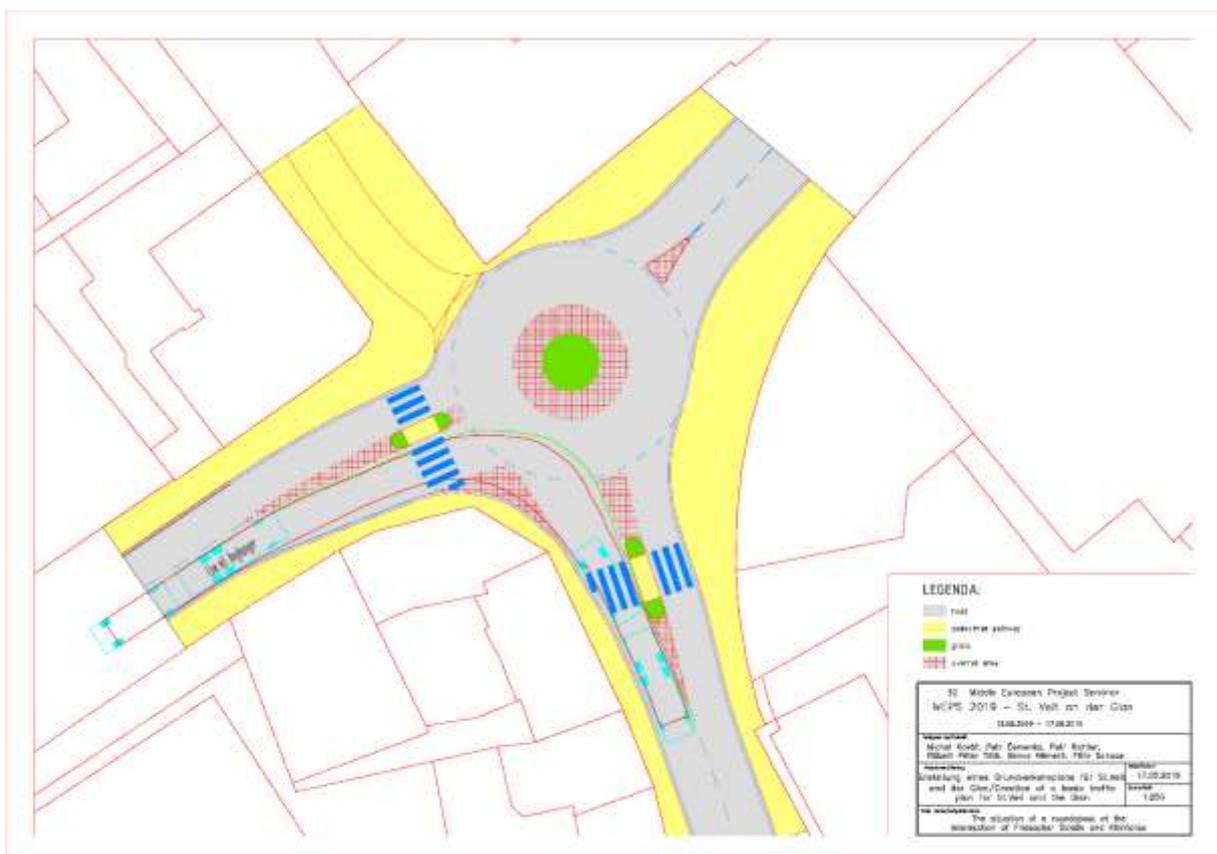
Proposed redesign of the roundabout Bahnstraße/Klagenfurter Straße - tatrix curves
